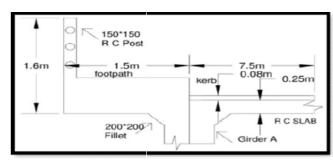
Details of footpath, parapet, kerb and deck slab
